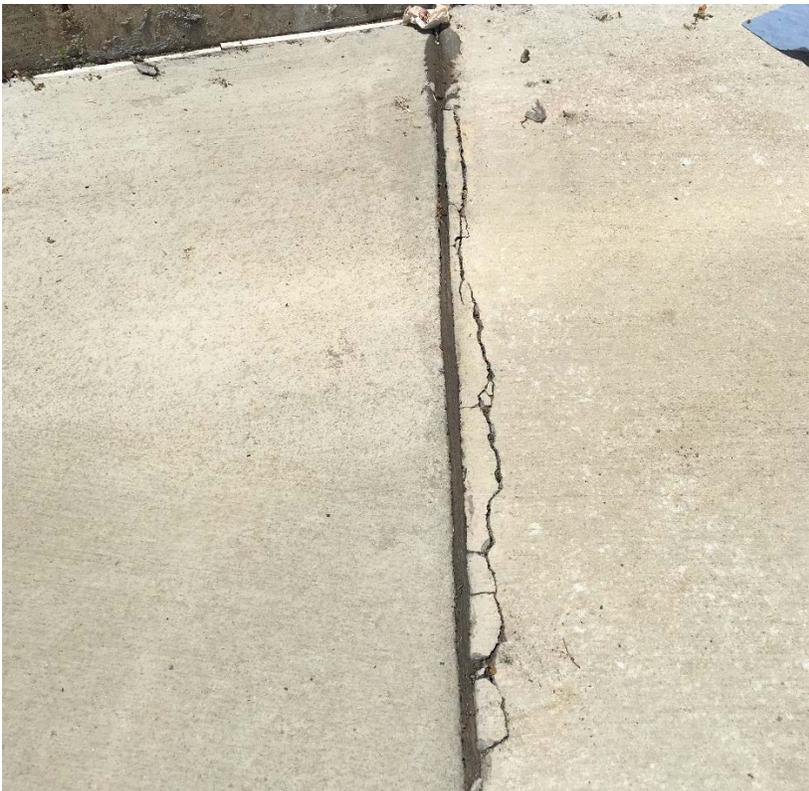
MARTA Brady Facility – EdenCrete slab (Left of joint) adjacent to Reference slab (Right of joint)
